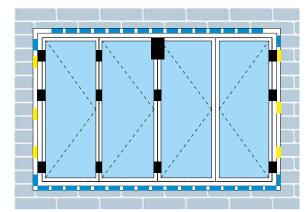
B Glass shiming of folding sliding frame with loads on the upper guide.
